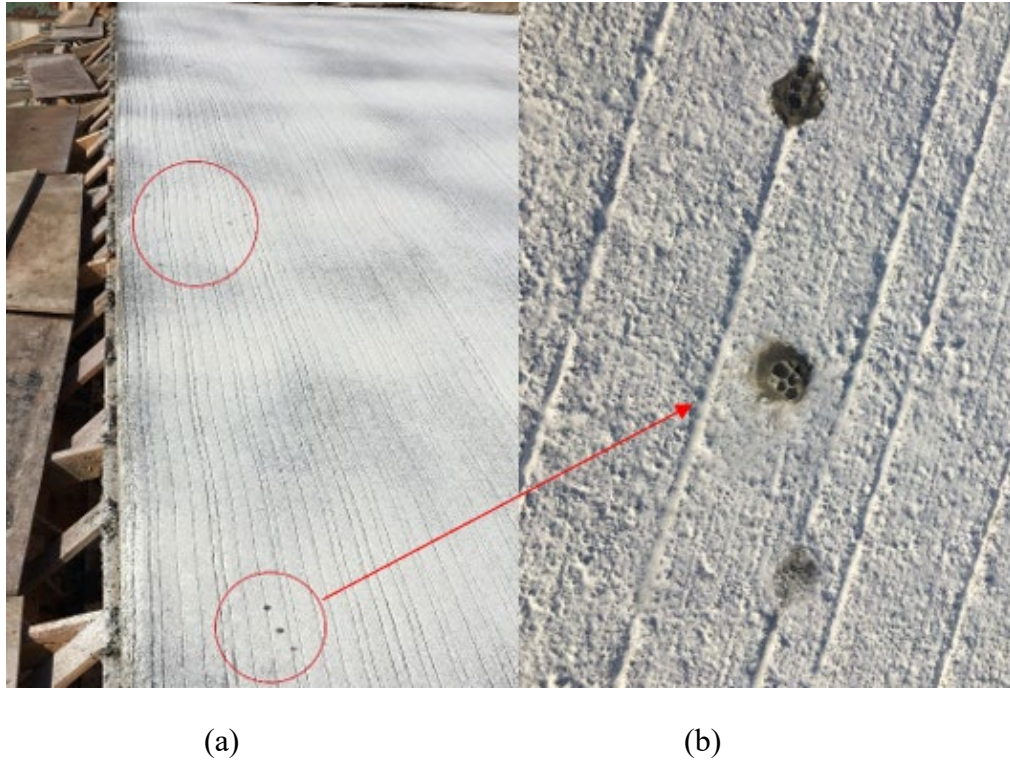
Trapped air pockets on top of the east end abutment (a) overview; (b) close-up (image provided by MnDOT)
